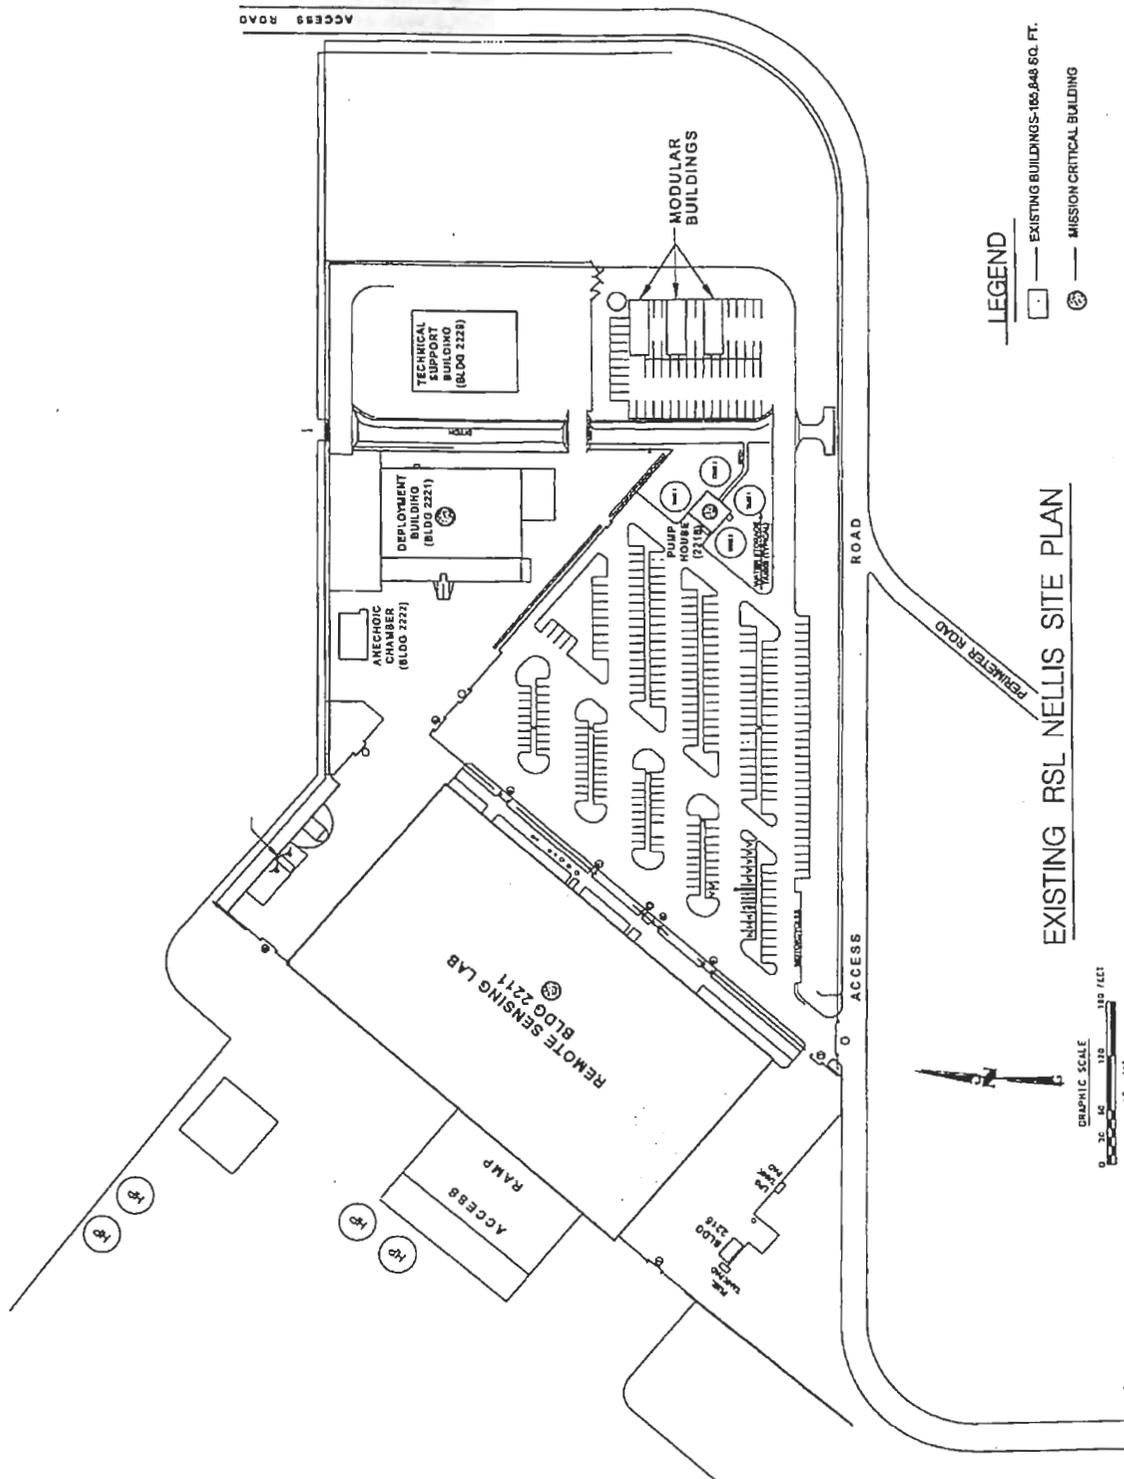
Remote Sensing Laboratory-Nellis Existing Site Plan
